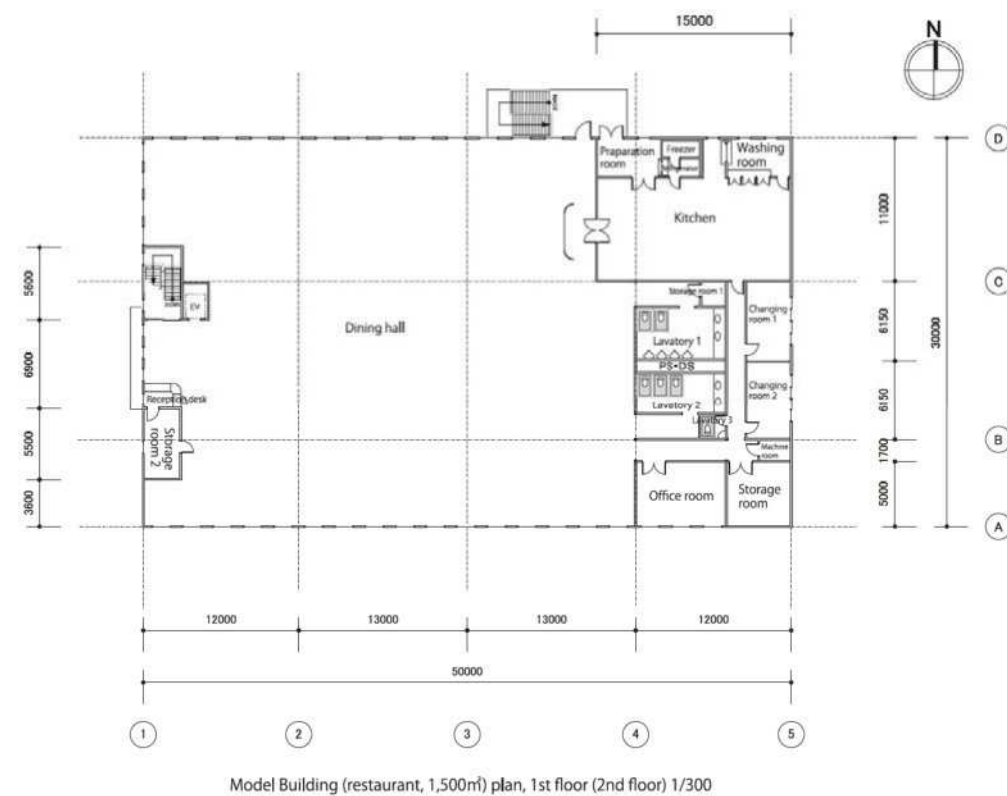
Model building (restaurant, 1 500 m²) plan, first floor (second floor) 1/300
